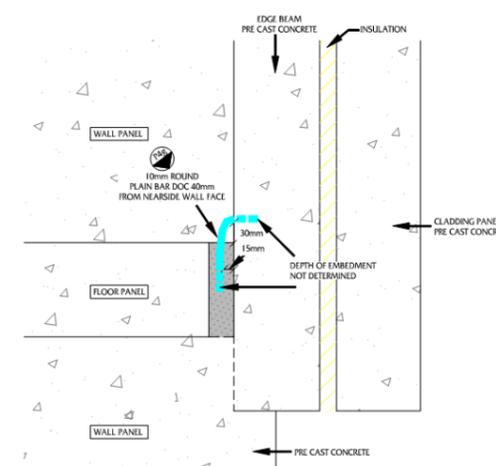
connection details of edge beams to wall supports (from GBG report)
